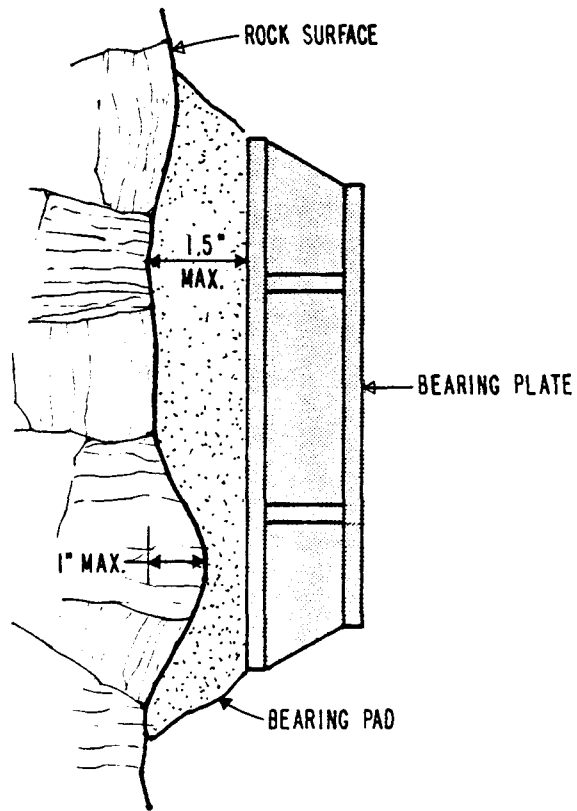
ALLOWABLE DIMENSIONS FOR ROCK SURFACE AND BEARING PAD, RIGID PLATE LOADING TEST.
